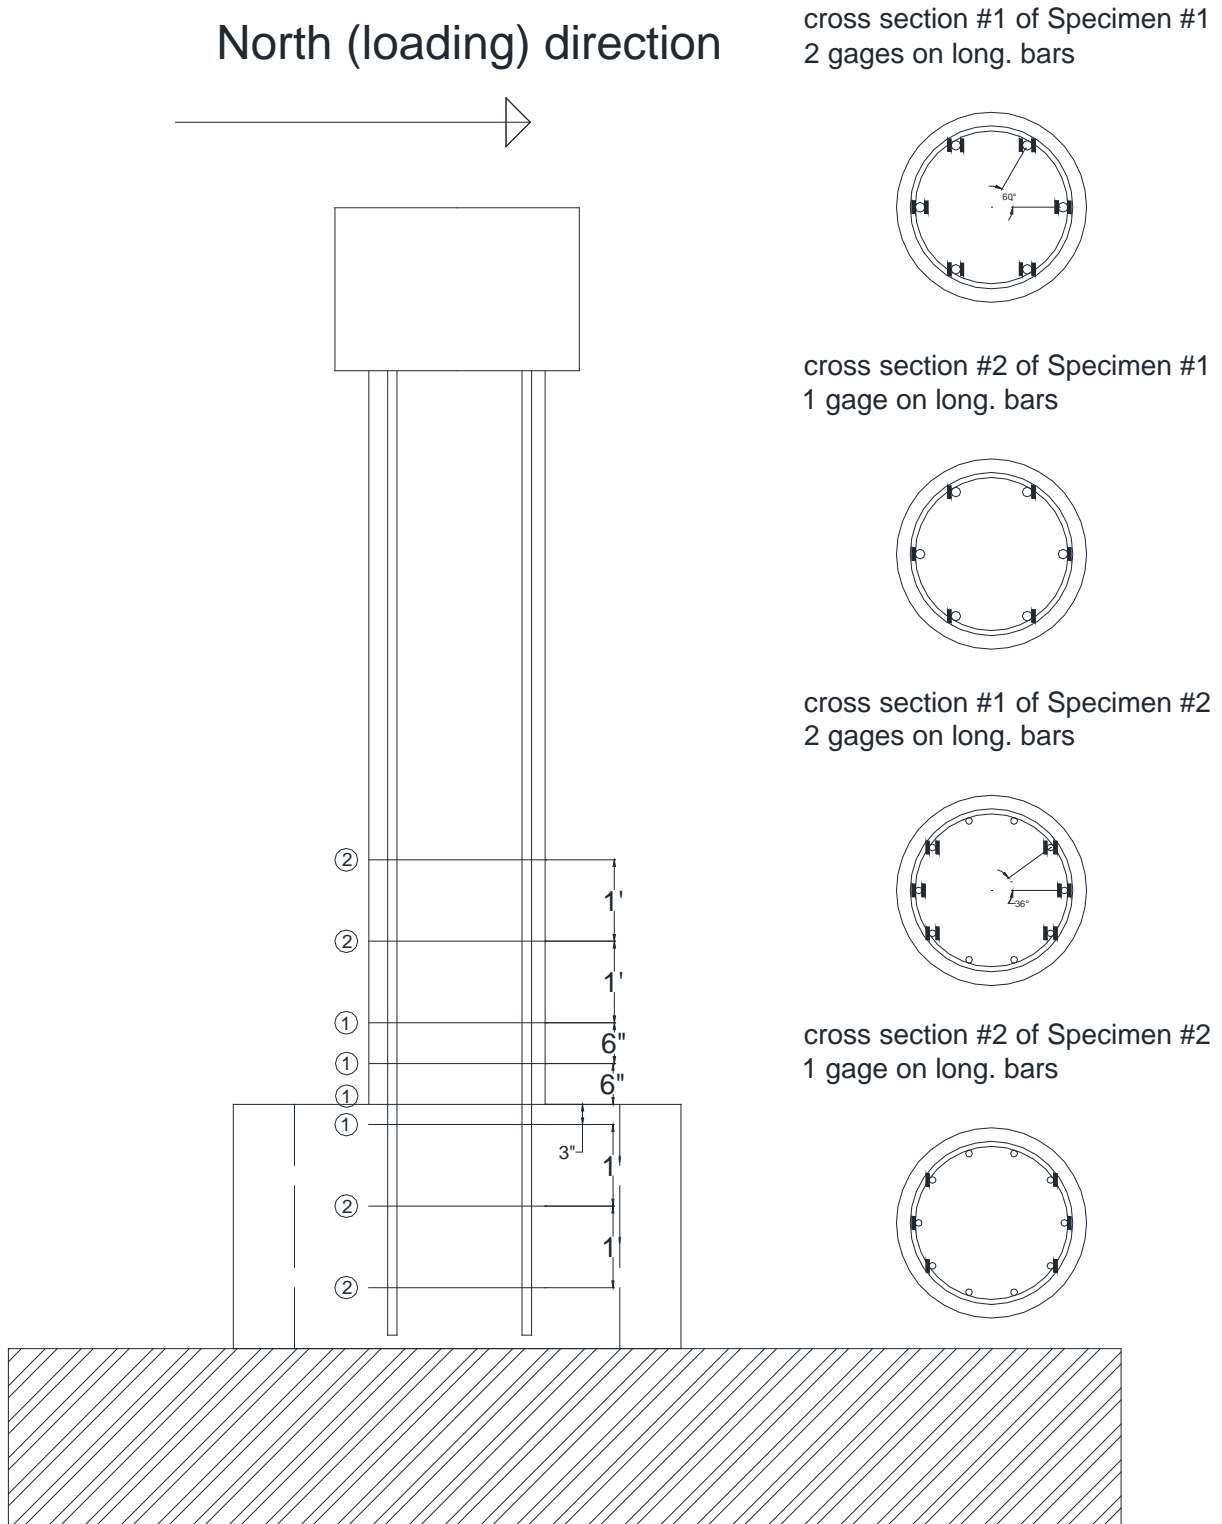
Strain gages on longitudinal bars of Specimens #1 and #2
